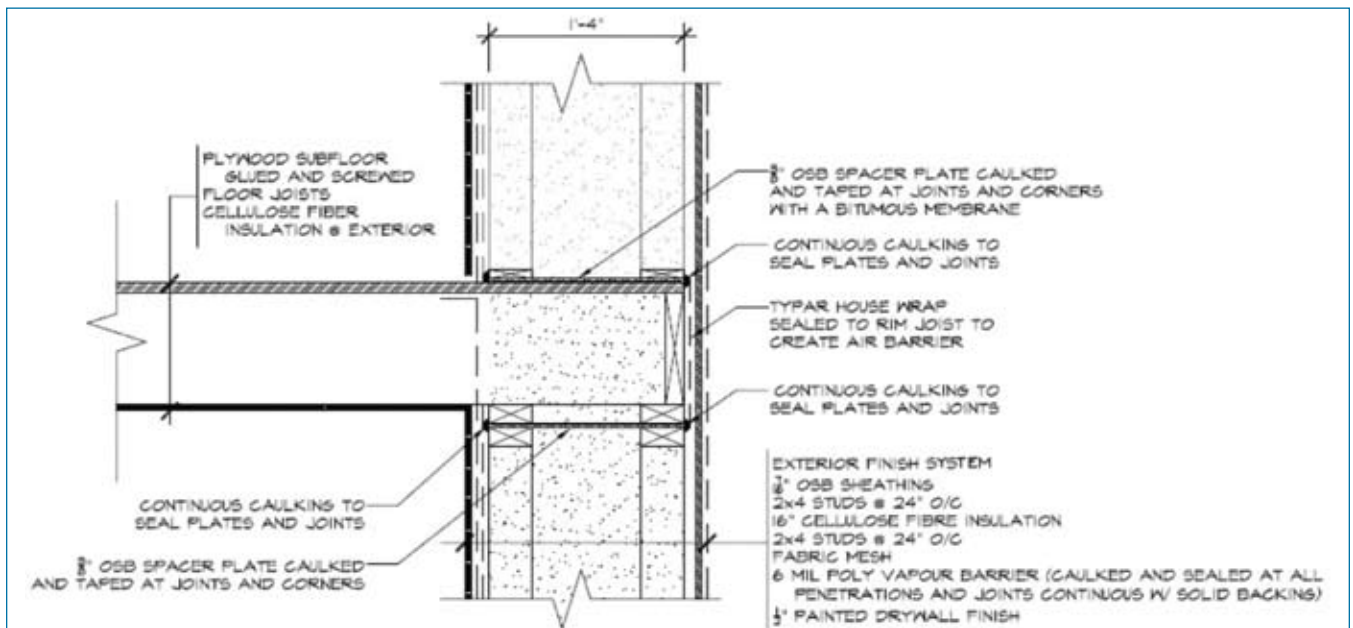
Cross-Section of Riverdale NetZero Deep Wall System at the 2nd Floor
